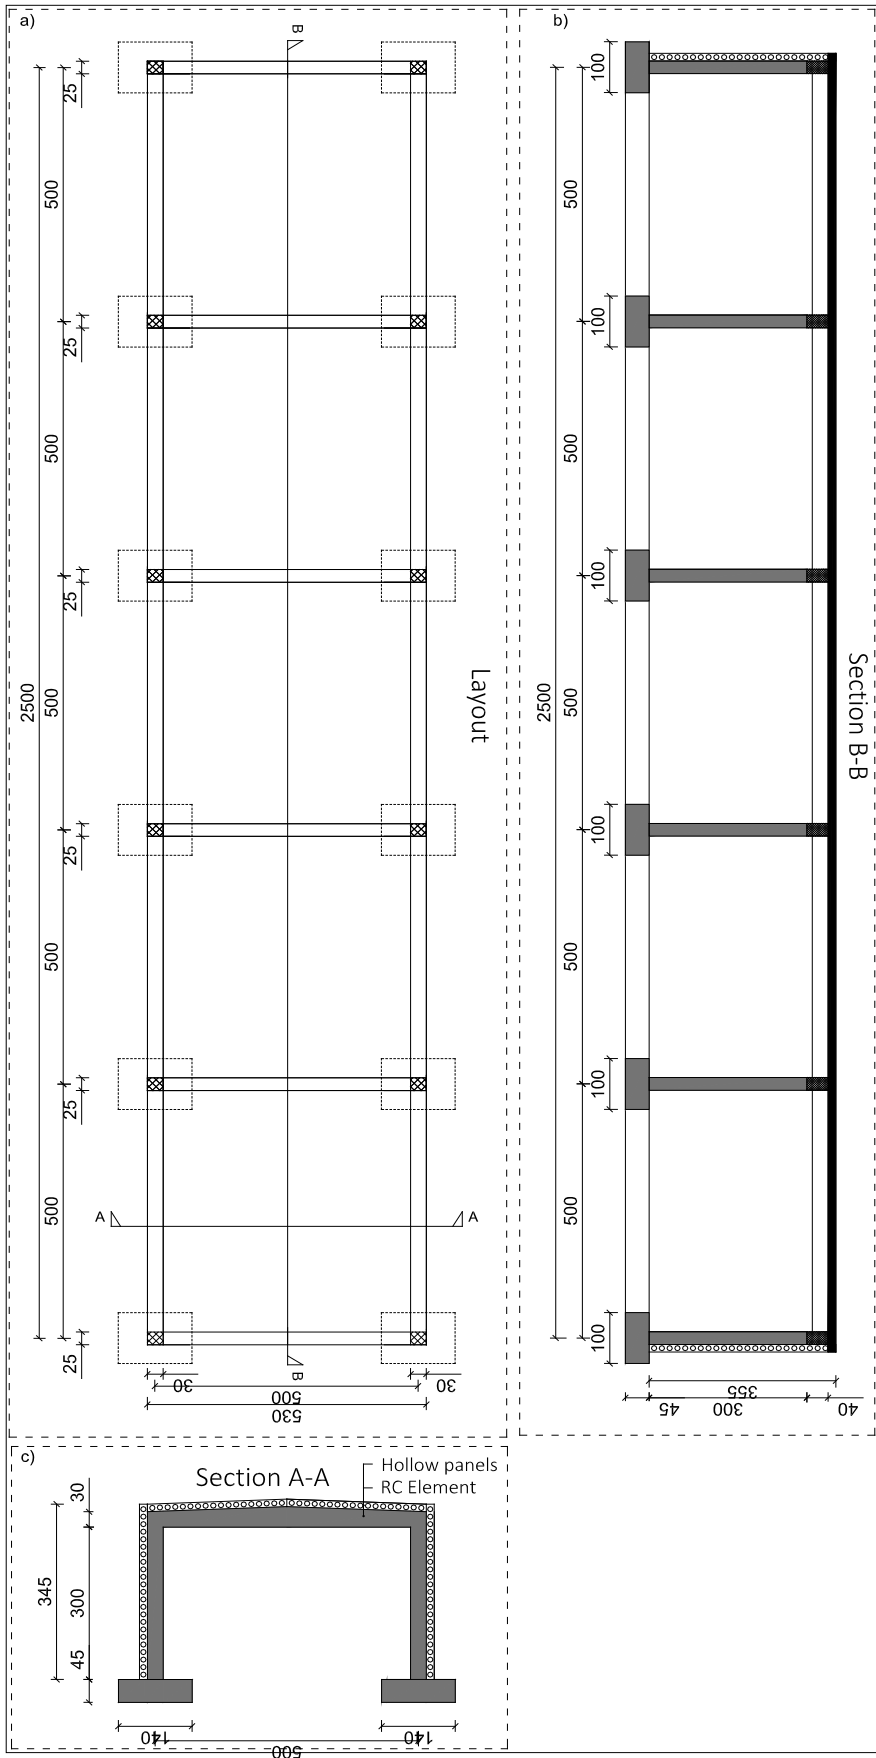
Case study building drawing, a) Layout, b) section B-B, c) section A-A
